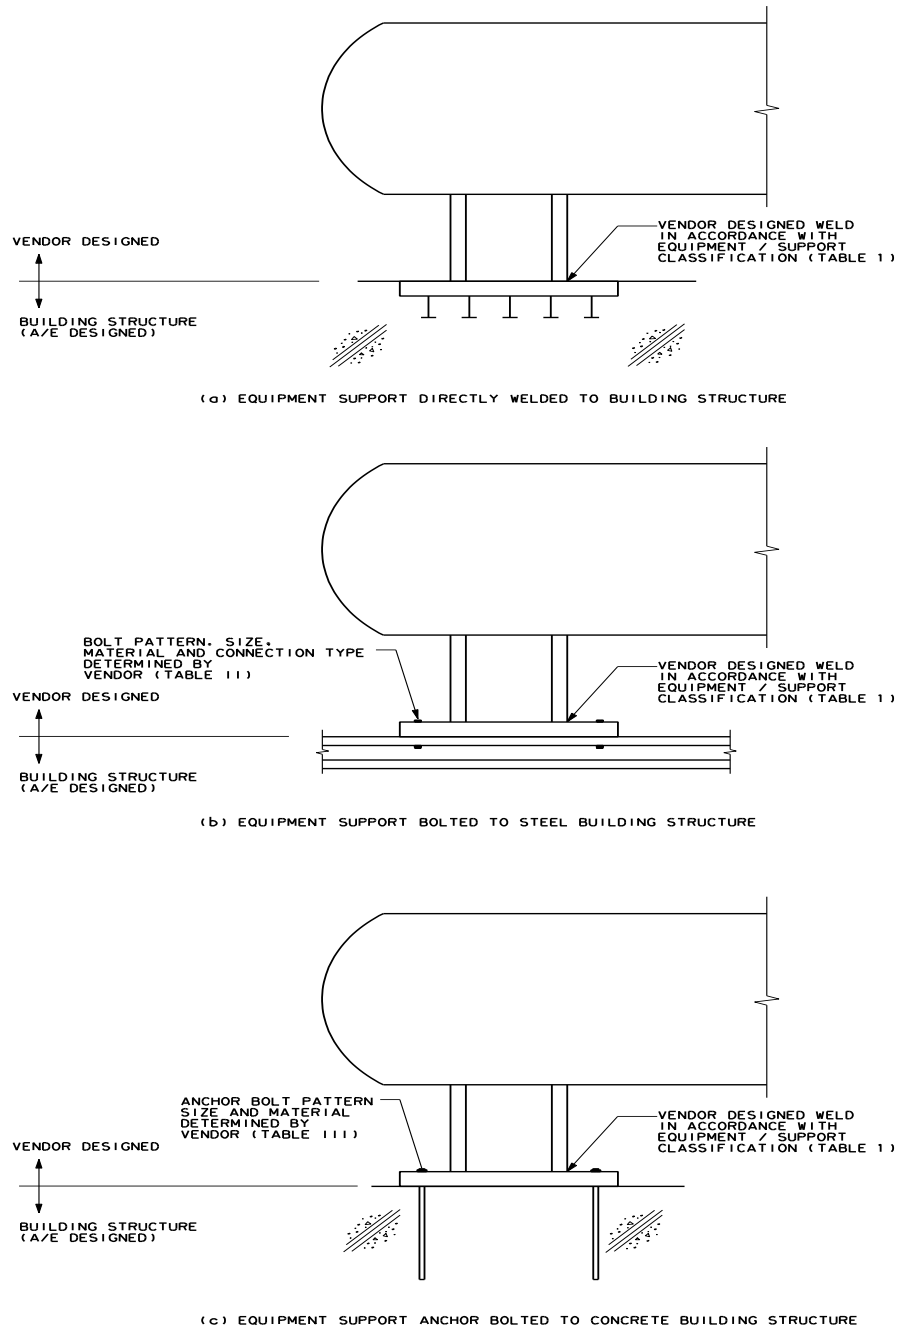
Typical Examples of Equipment Attachments to Building Structure
